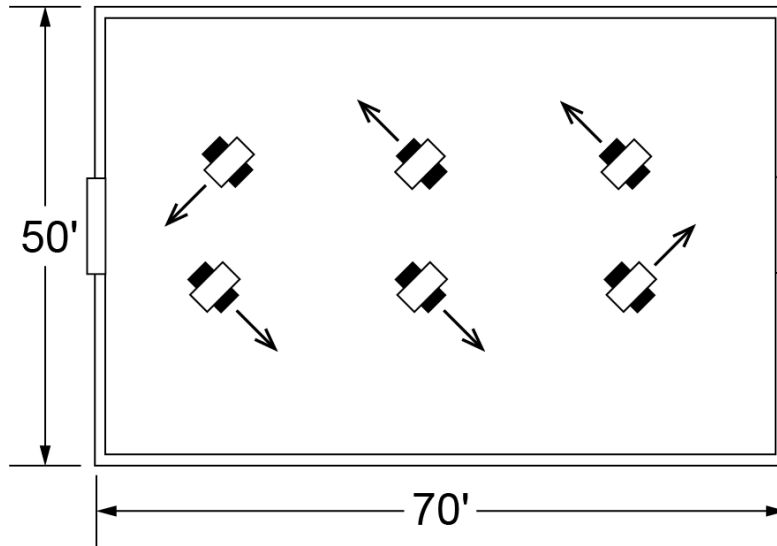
Horizontal unit heaters arranged for four high heat loss walls. (Skilled Trades BC, 2021) Used with permission.
